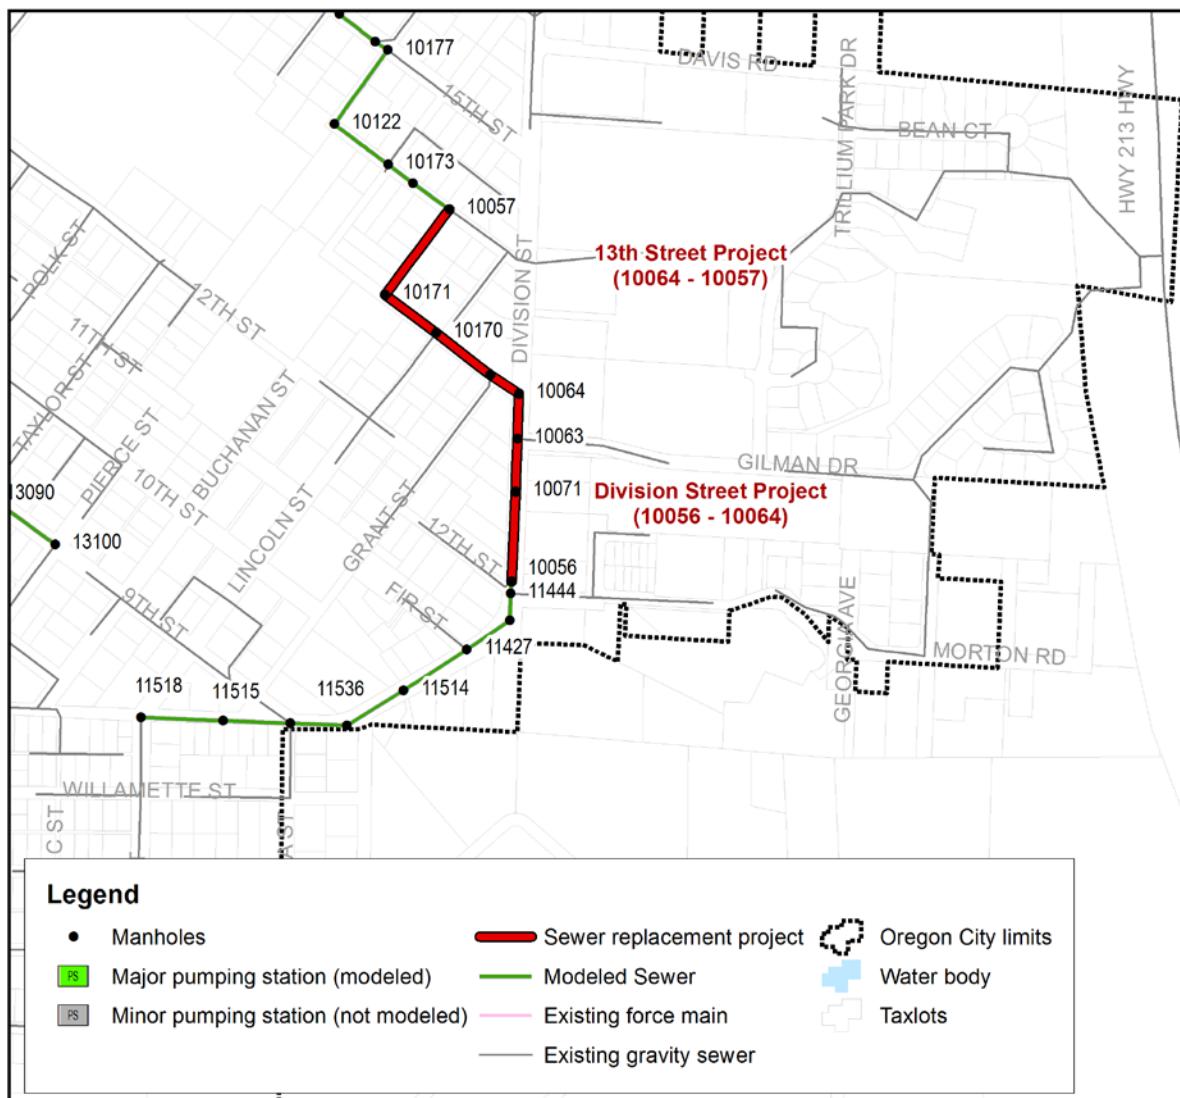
Required 13th Street and Division Street sewer upgrades, 1- in 5-year storm event
